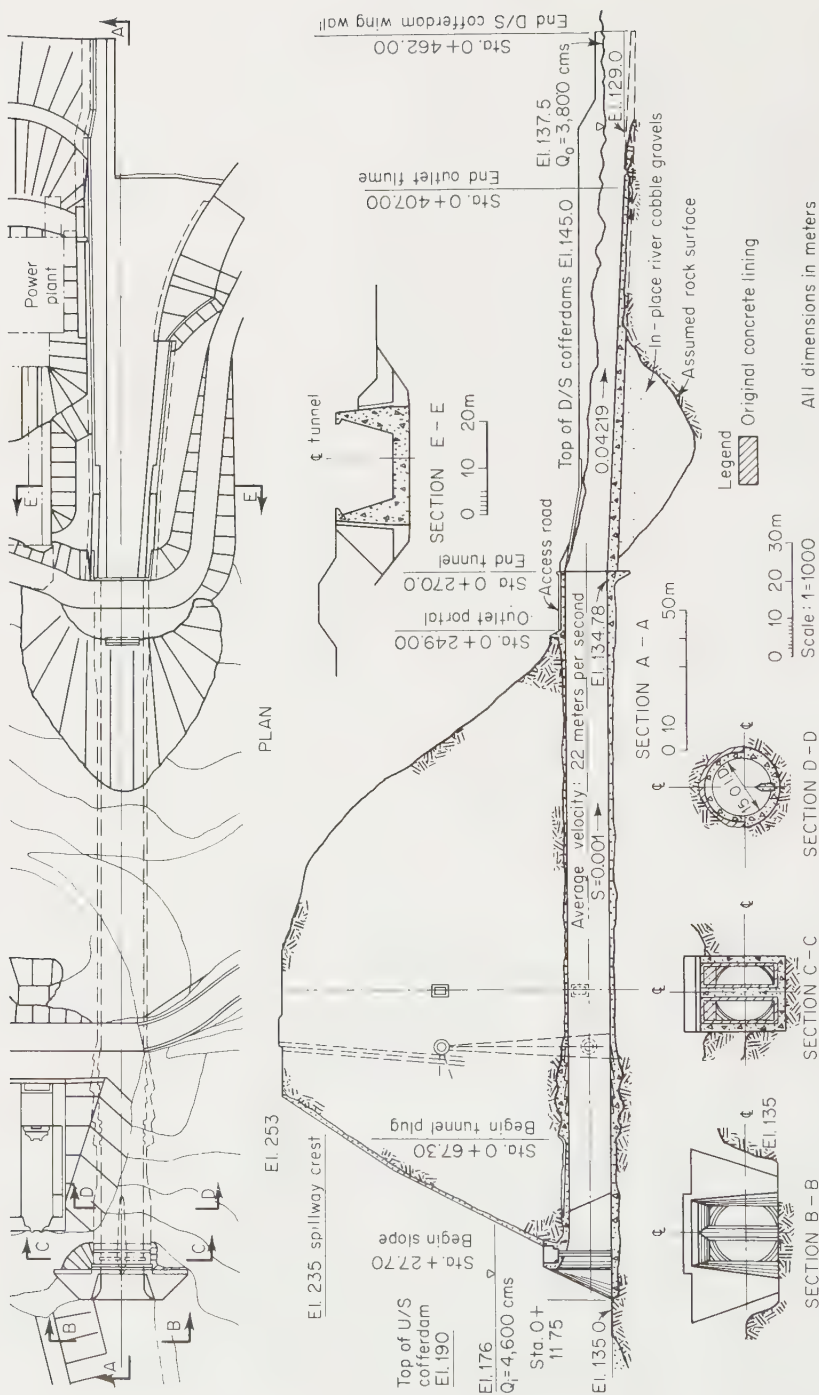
Shihmen Reservoir project—section through tunnel. (Courtesy of Tippetts-Abbett-McCarthy-Stratton, Consulting Engineers, New York.)
